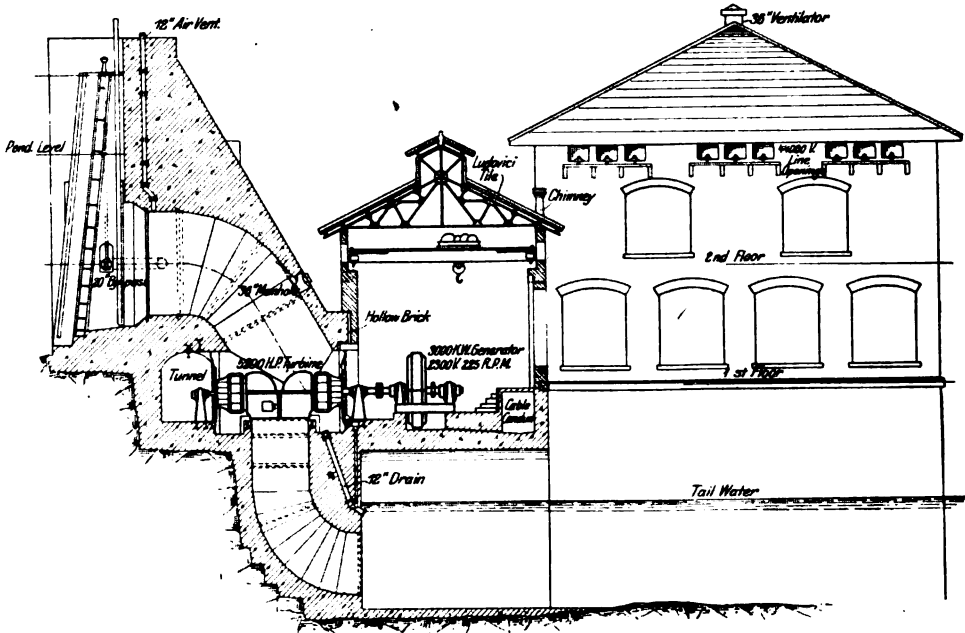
Sectional Elevation of Great Falls Power Plant.
